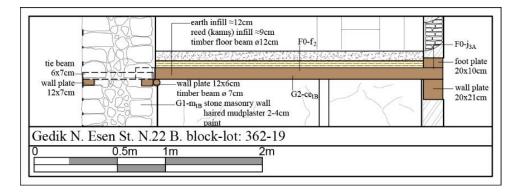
Drawing of flooring (Type 2) (Gedik N. b.block-lot: 362-19)
